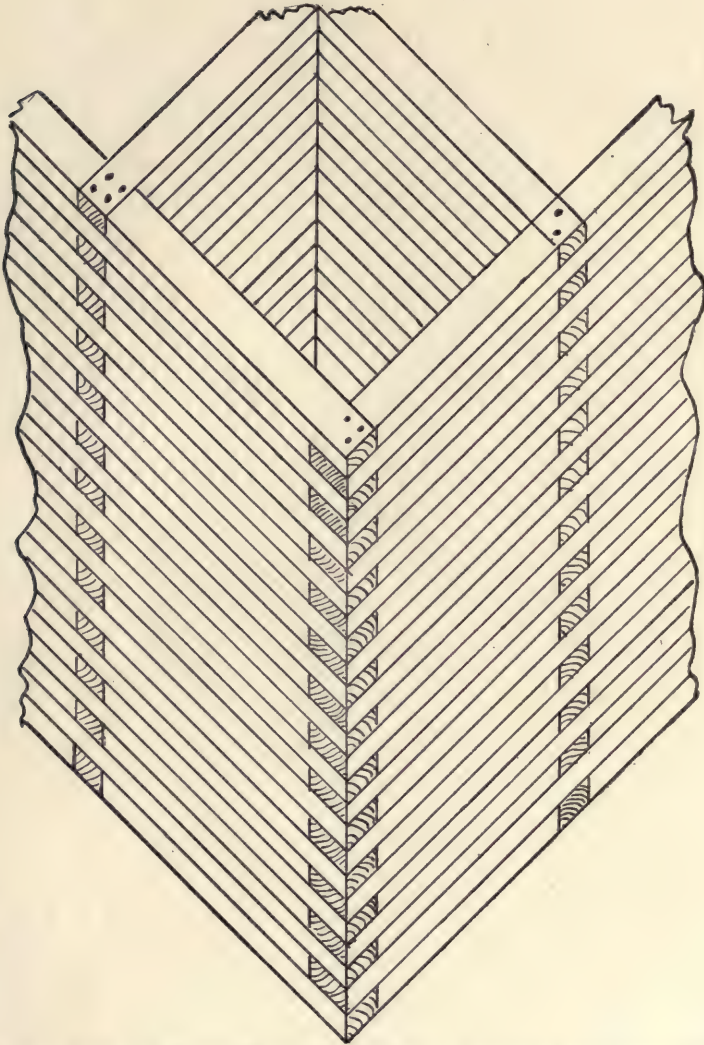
Method of Building Wooden Grain Bins by Overlapping and Crossing Joints.
